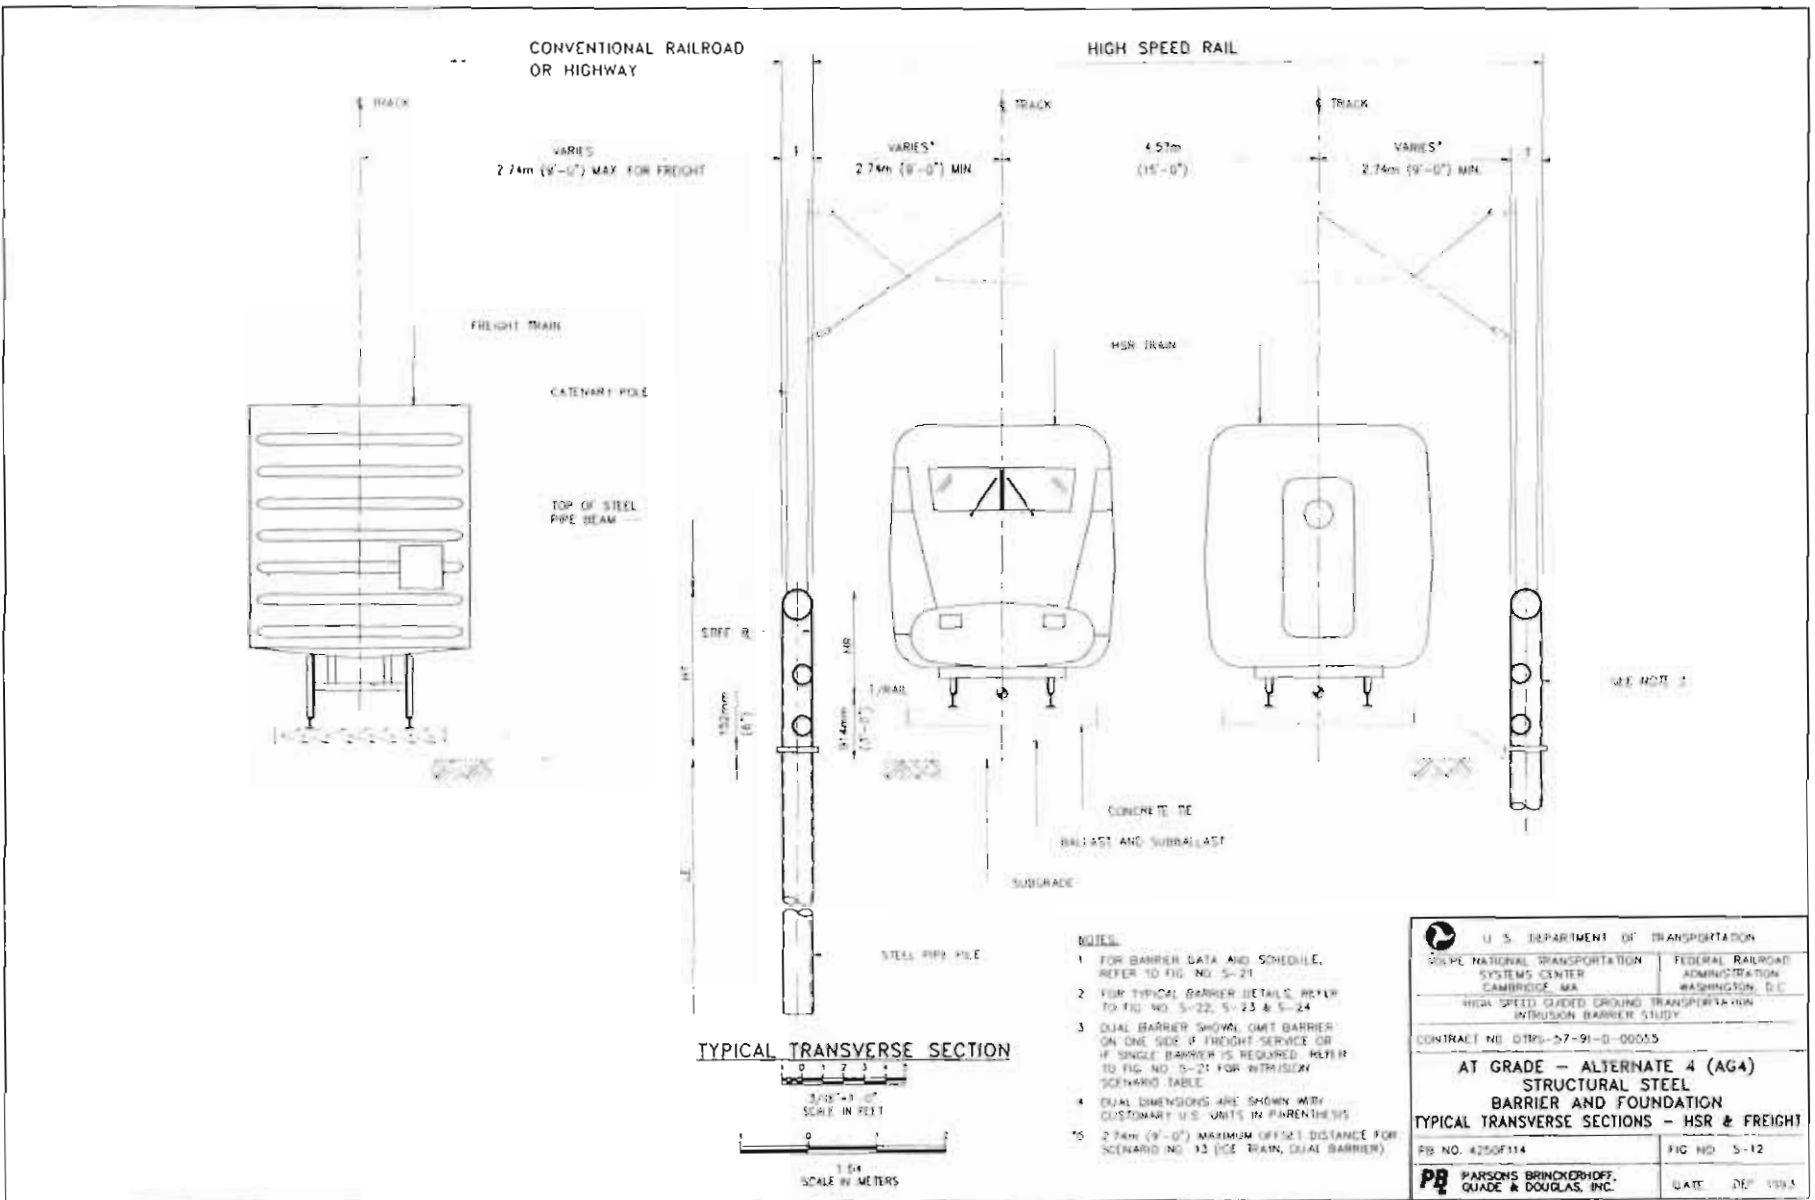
AT GRADE ALTERNATE 4: STRUCTURAL STEEL POST, RAILING AND FOUNDATION - TRANSVERSE SECTION/RR
